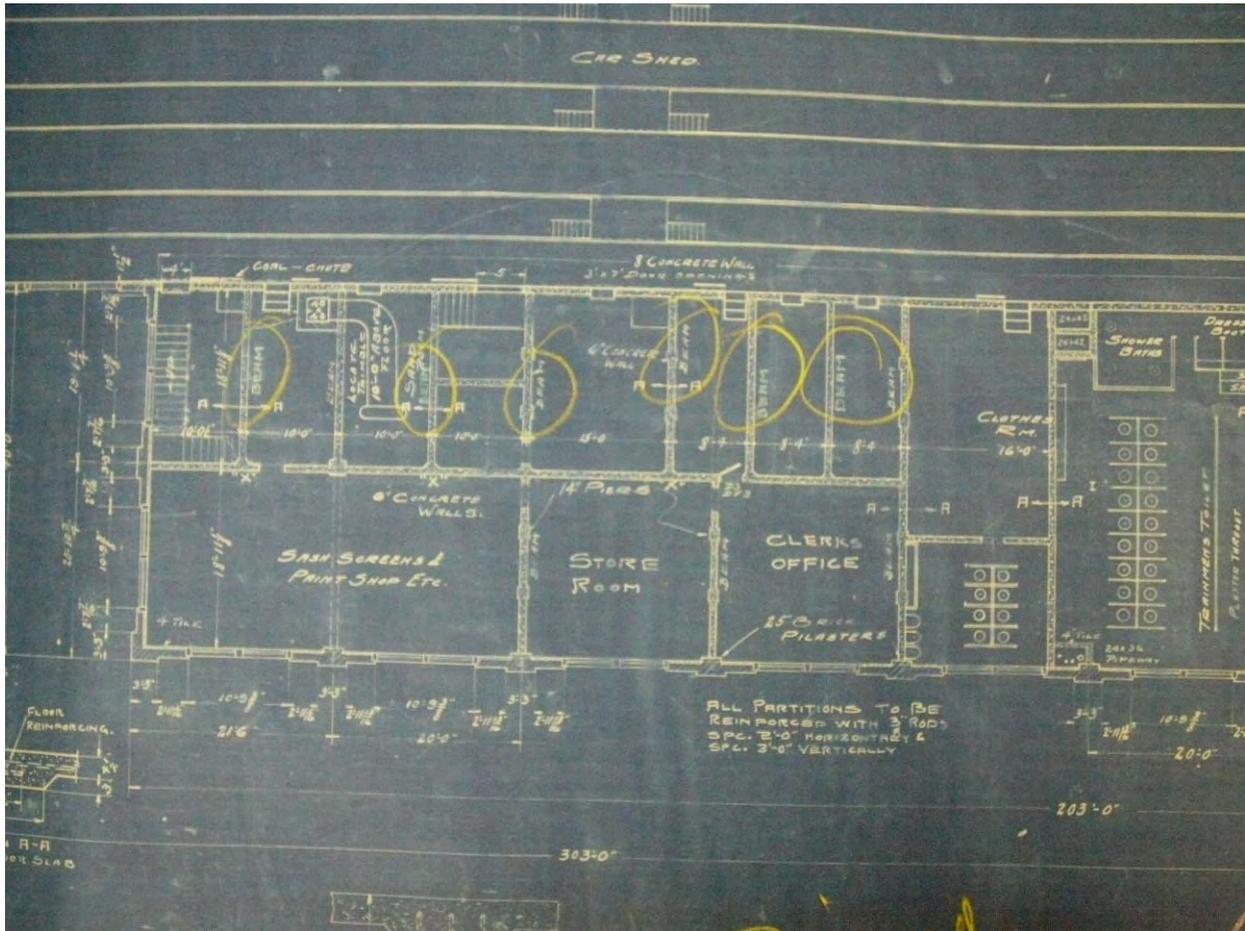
First floor service rooms, north side of building, source: Northwest Architectural Archives
